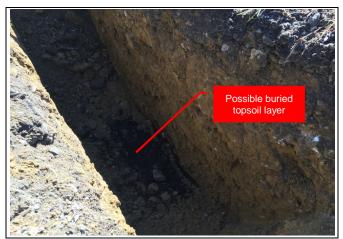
Possible buried topsoil layer encountered 4 ft. below ground surface.
